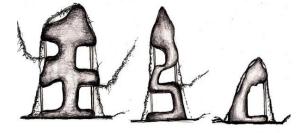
Schematic typical plan and section of cave dwelling in Kendovan (Doraj et al., 2021)
